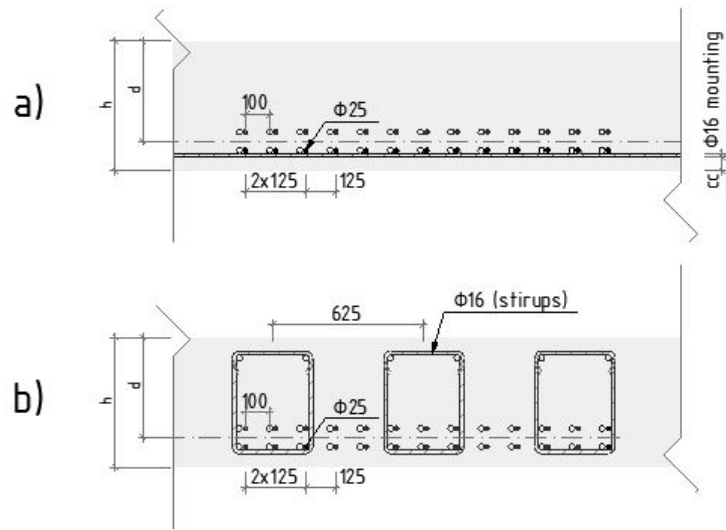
Reinforcement design with 2 layers of tension reinforcement. a) section without shear reinforcement. b) section with shear reinforcement.
